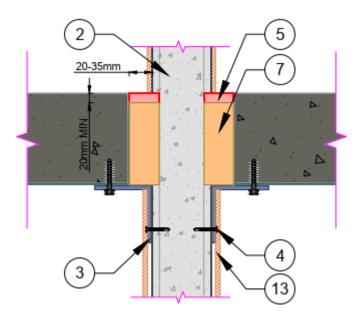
Dual wall system with vertical wall between horizontal walls – gap width of 20-35 mm between the stair and vertically oriented wall
